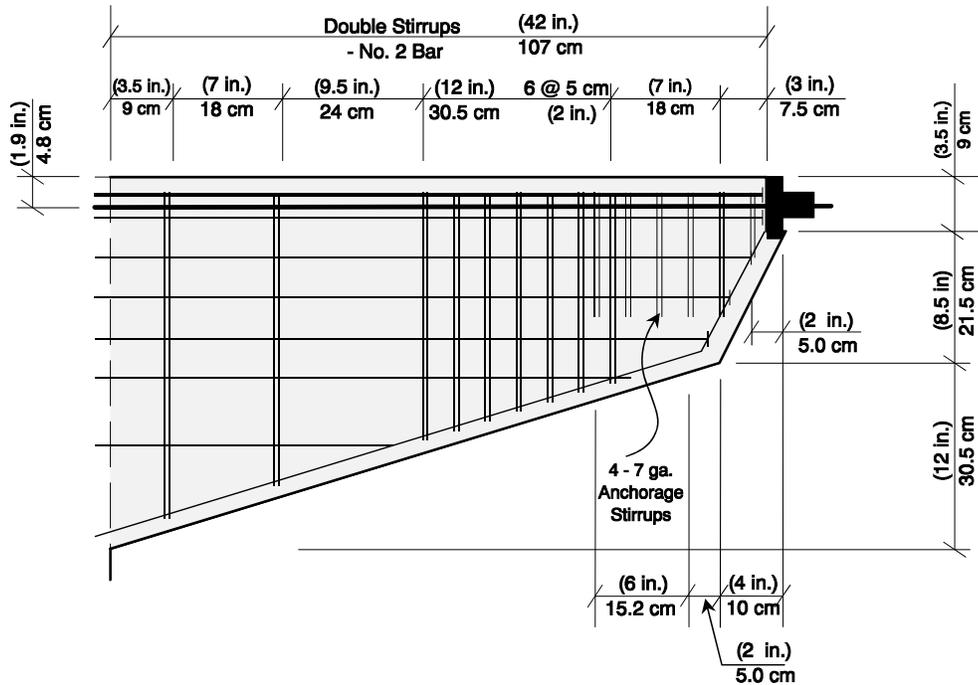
POJ-PU-54-TH transverse reinforcement details
